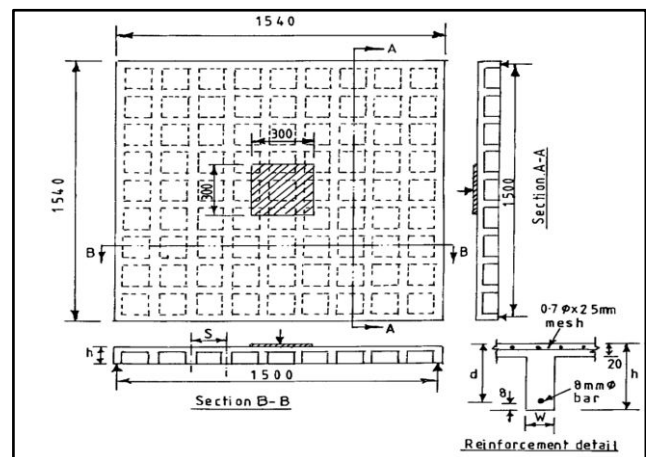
Geometry of waffle slabs, loading arrangement, and reinforcement details [8].
